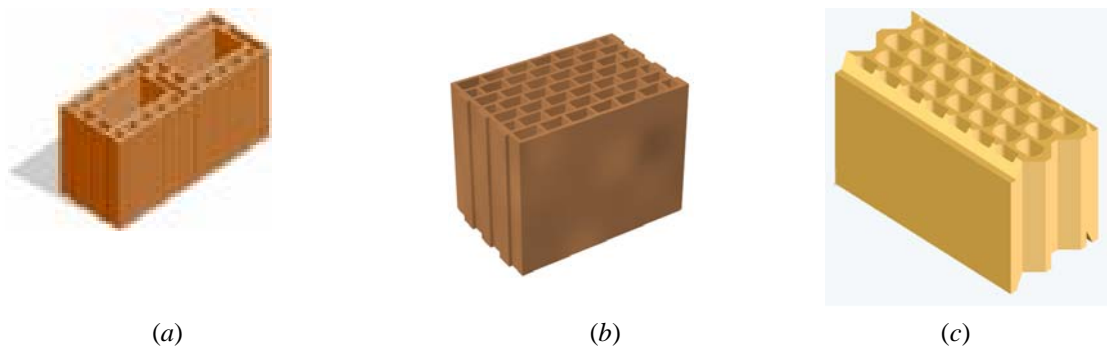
Structural traditional brick (a), Germany structural brick (b) and proposed brick model by Faria, Monetto and Brochado (2004) (c).
